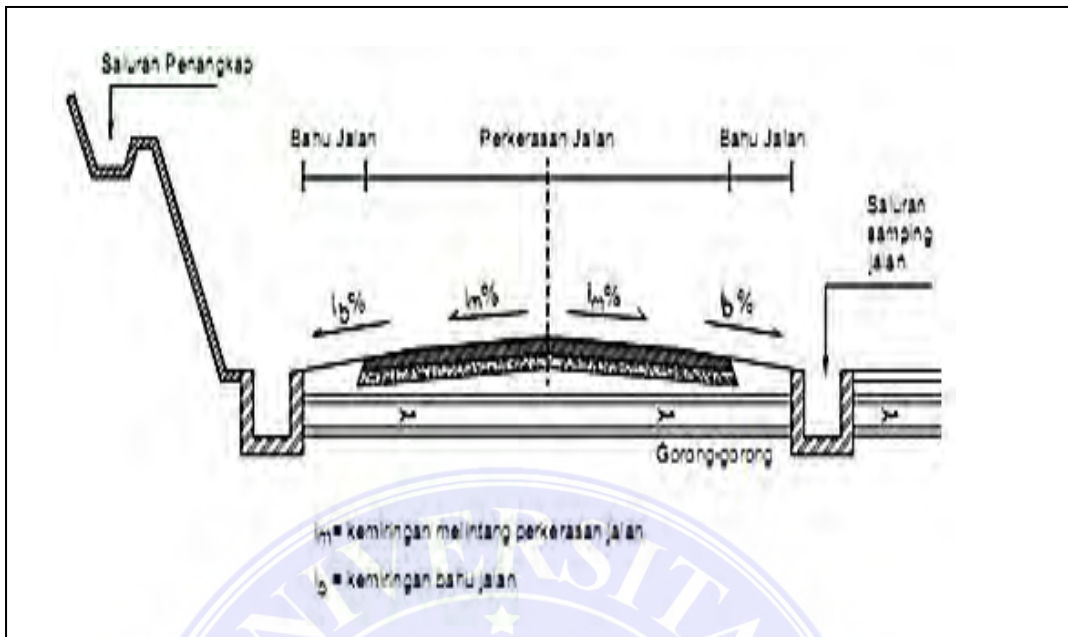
Typical Road Drainage System on Source Porous Pavement; WA et al 2010
